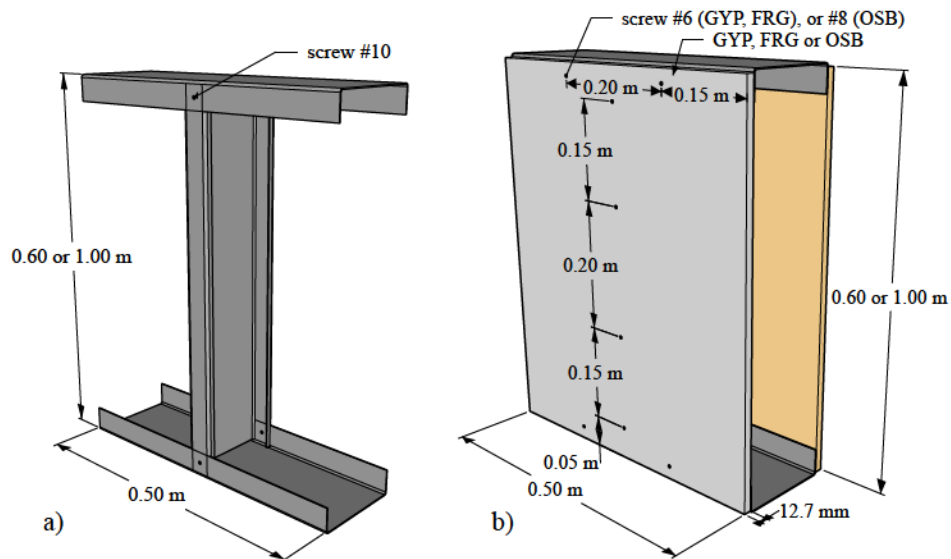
CFS stud specimens a) bare and b) sheathed
